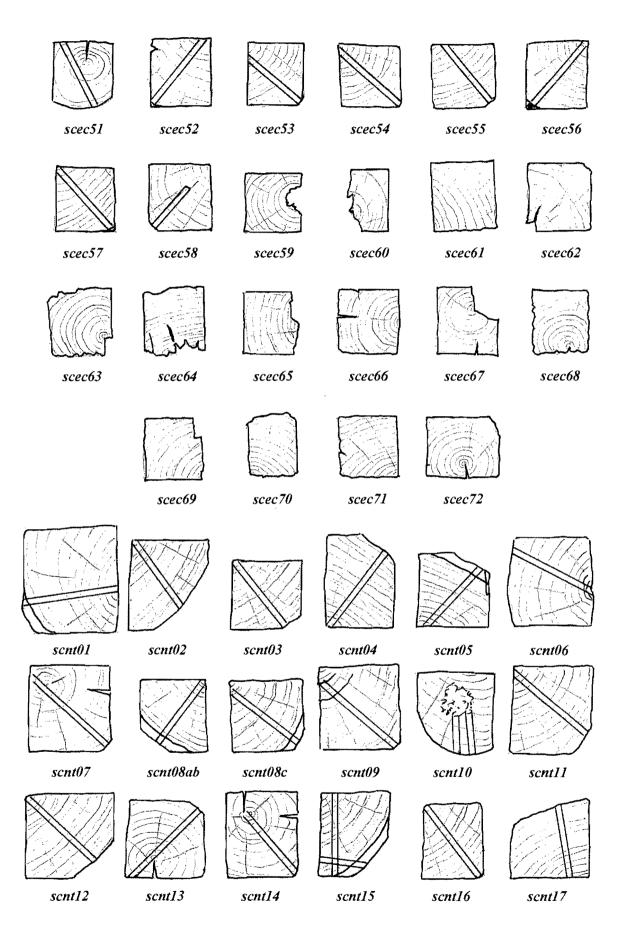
(cont): Scale section drawings of timbers sampled (scale 1:8)
